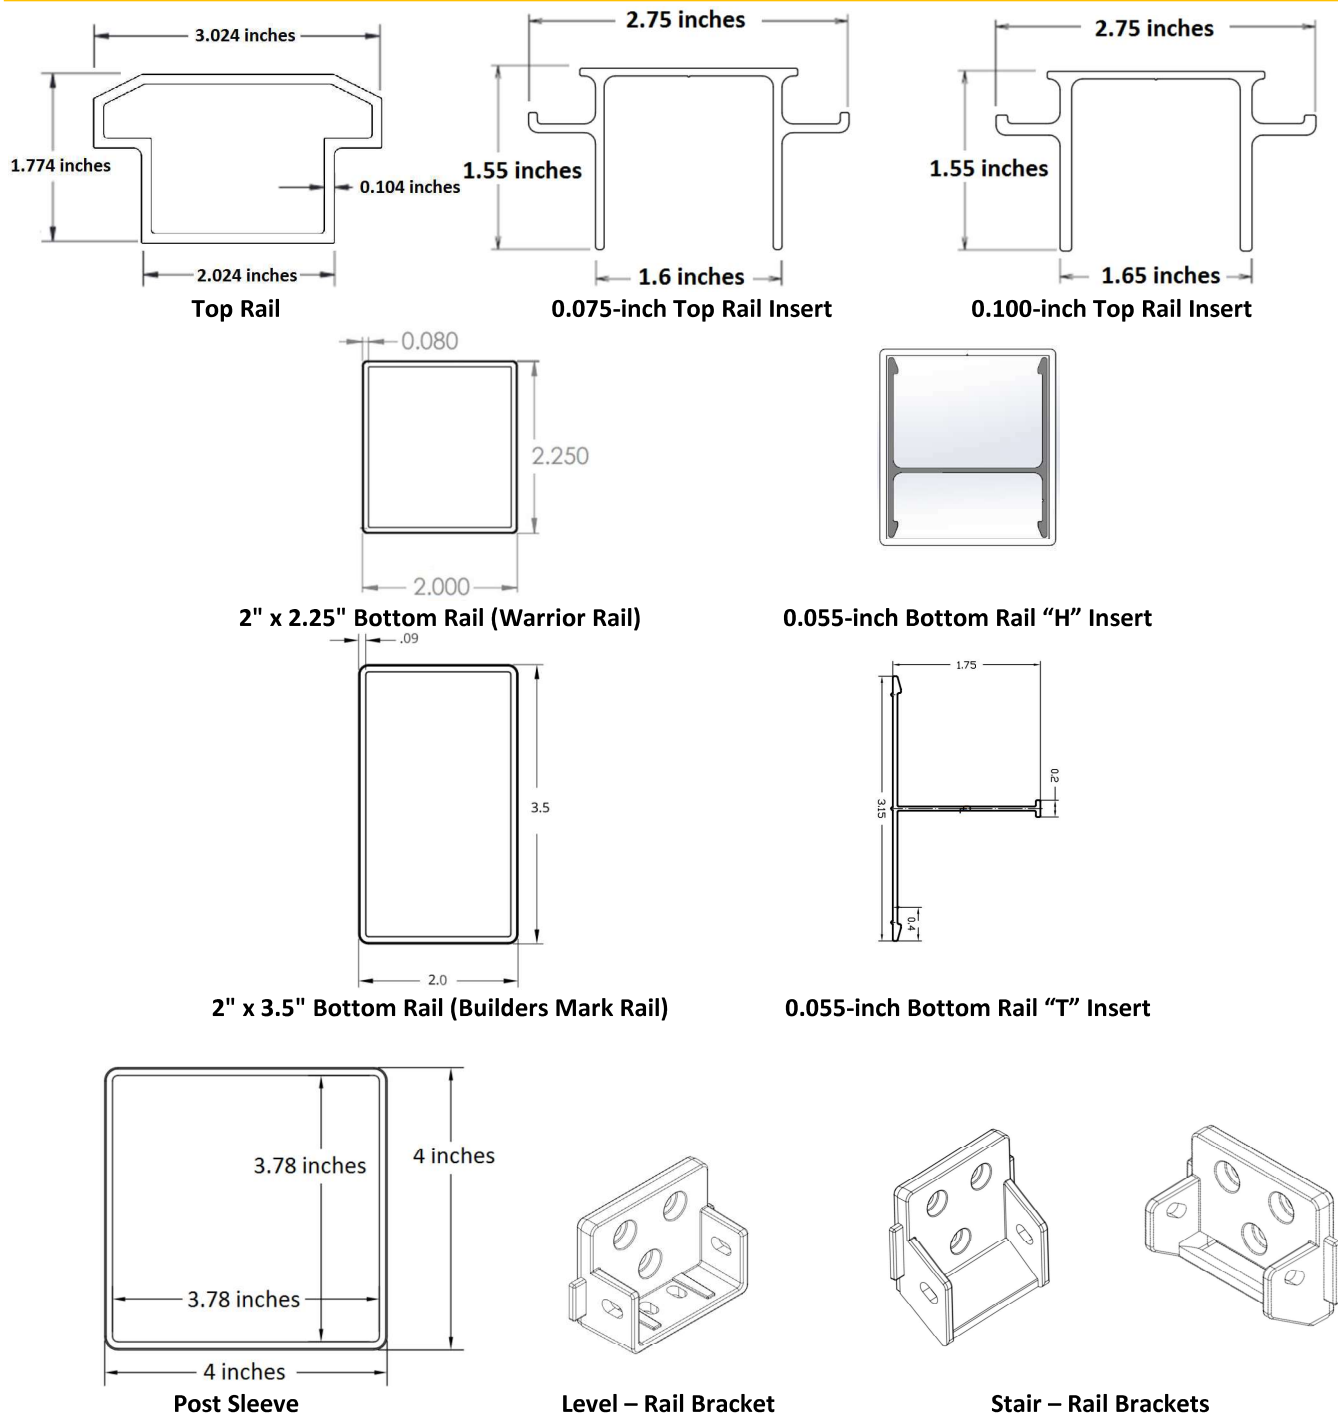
300 SERIES PVC RAILING PROFILES AND BRACKETS
